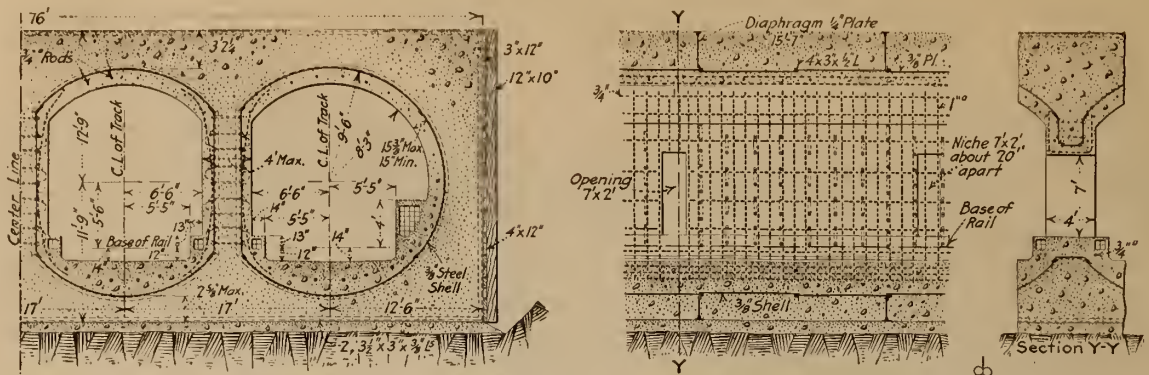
SECTIONS OF HARLEM RIVER TUNNEL
